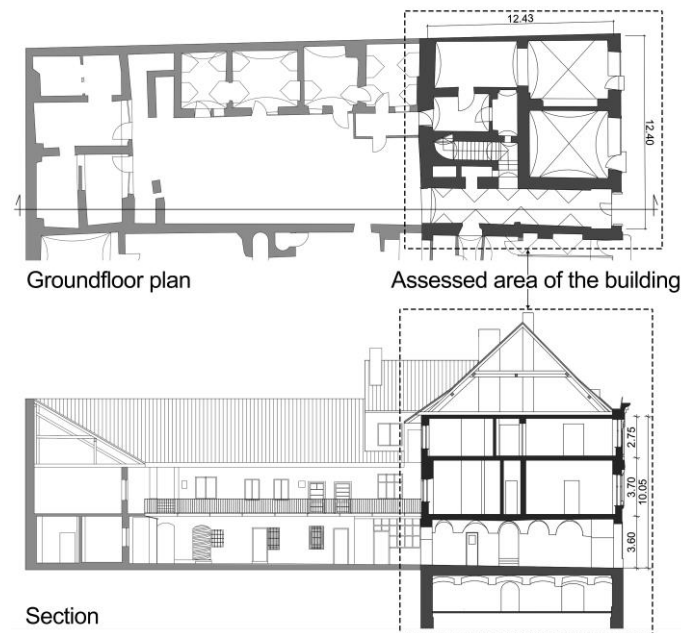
Groundfloor plan and section of the 18th-century building [167]
